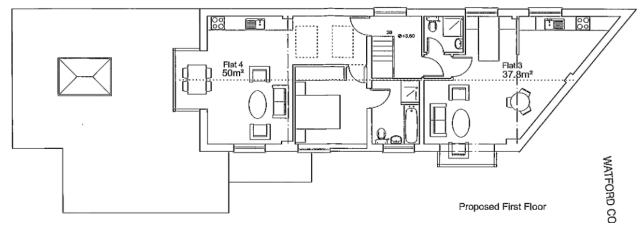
Refused proposed first floor plan for planning application 15/01385/FUL.
